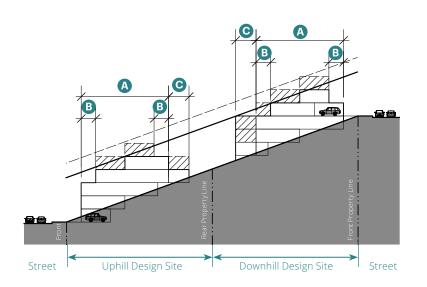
Allowed Location of Bonus Height/Floor Area from Front to Rear of a Sloped Design Site
